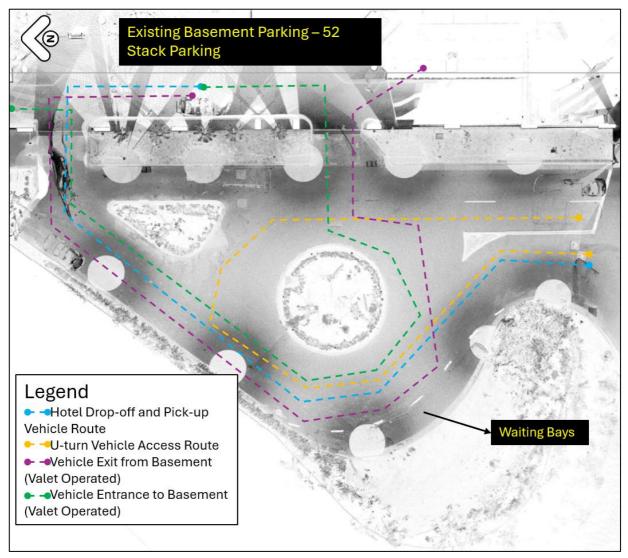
Existing Day Street Entry/Exit Route (Source: Hassell, modified by ptc.)
